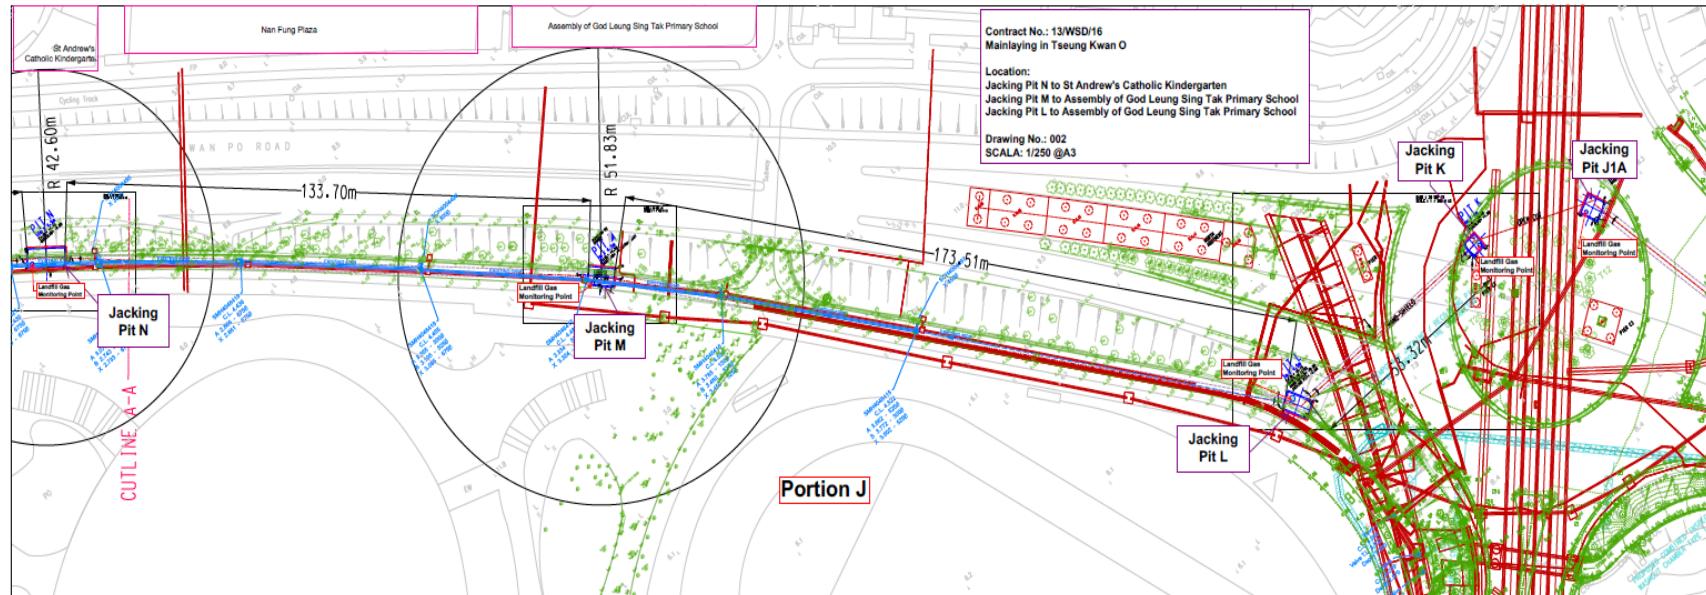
Location Plan for Portion J – Pit L-M-N, J1A, K
